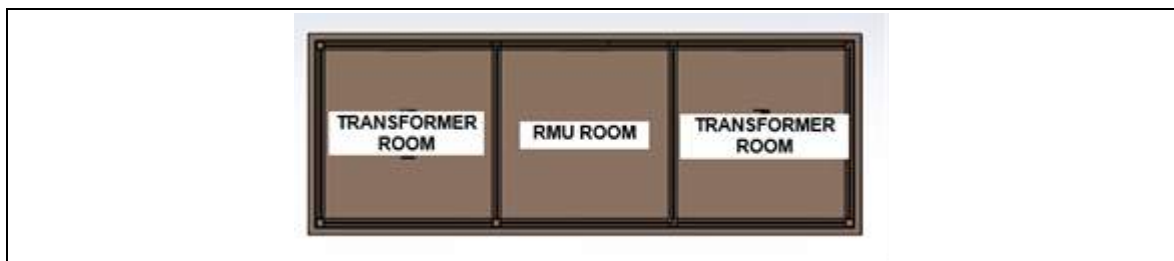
Typical Layout of the Transformer and RMU Building at Ultimate Capacity
